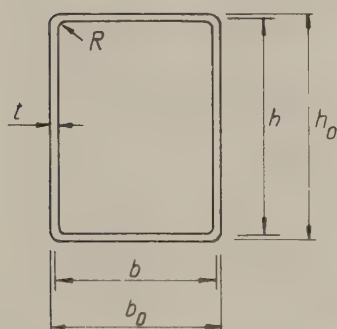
Notations for cross-sectional dimensions of a box beam.
